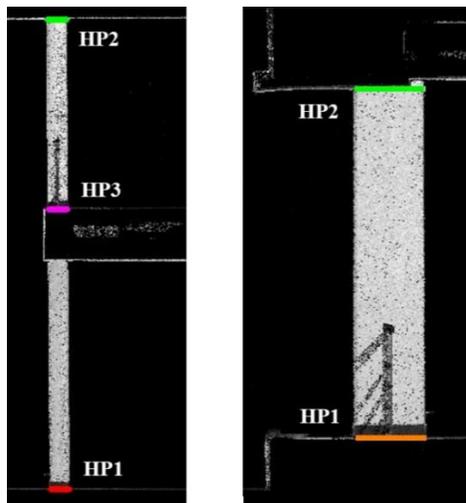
Positions of cross-sections on a circular (left) and rectangular (right) column
